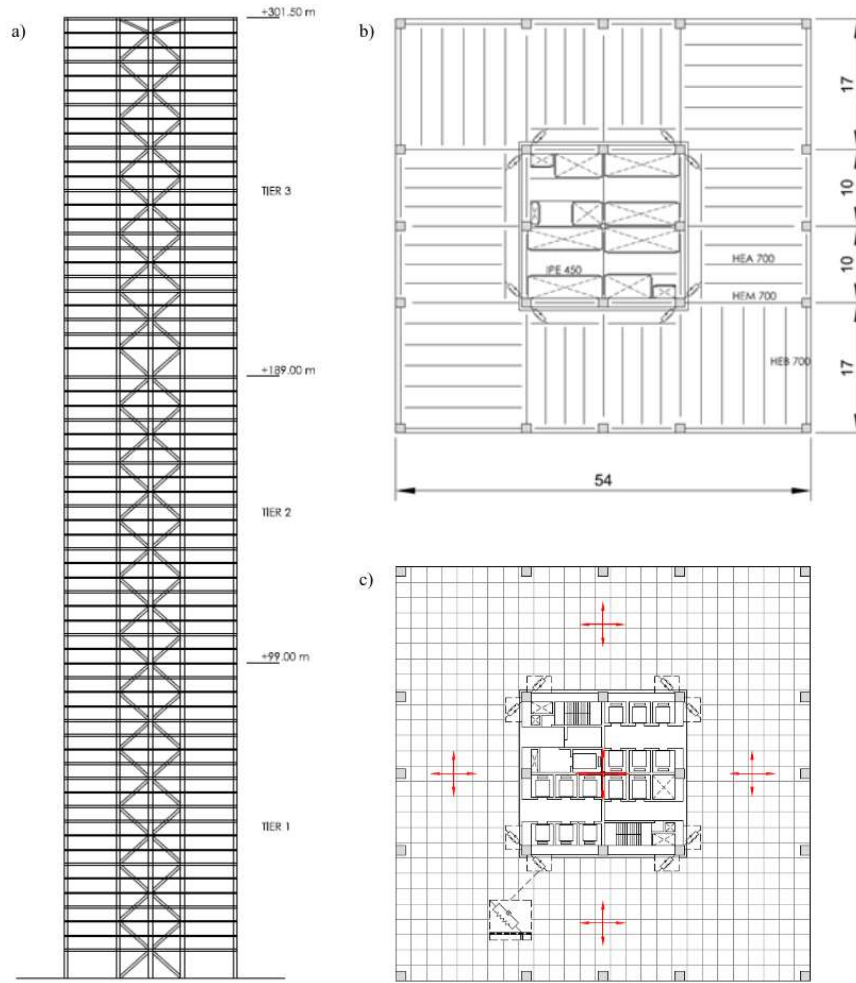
Investigated tall building geometry. a) Elevation, b) Typical structural floor plan, c) IDS implementation. (dimensions in metres)
